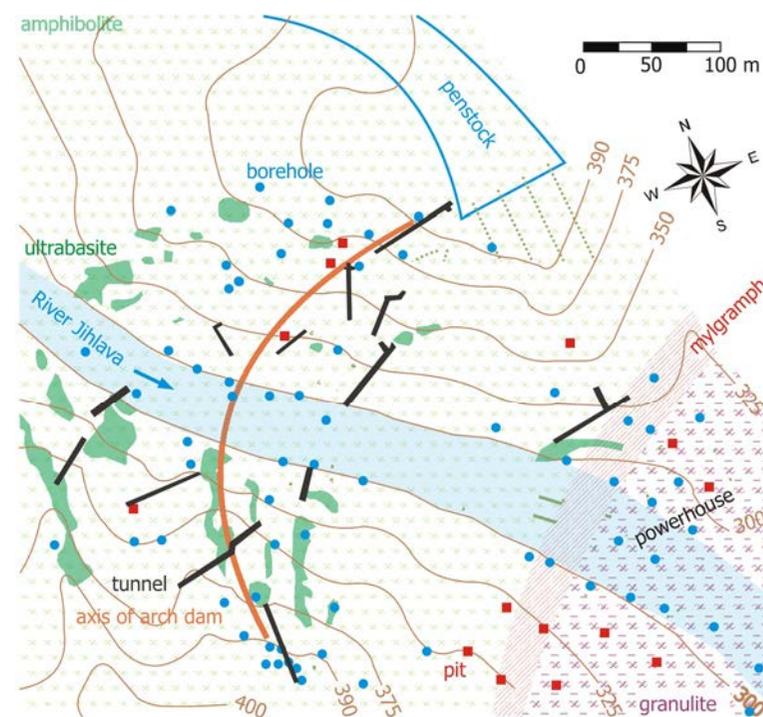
Layout of exploratory workings at the Dalešice dam
